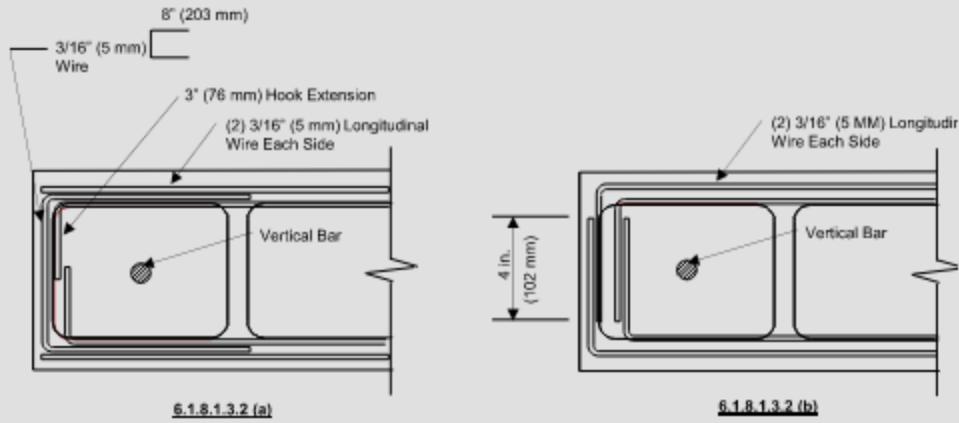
Anchorage of joint reinforcement with four longitudinal wires
